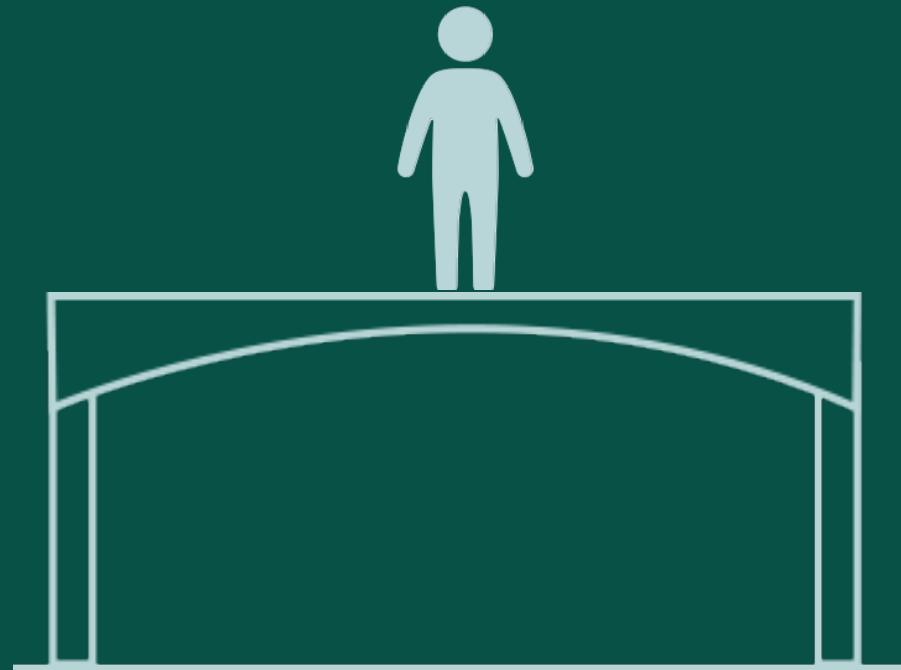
Catalan vault floor slab at SUDU project, Ethiopia, with lightweight stiffening walls and compacted fill. Image retrieved from López López, D., Van Mele, T., & Block, P. (2016). Tile vaulting in the 21st century. *Informes de La Construcción*, 68(544), 162. <https://doi.org/10.3989/ic.15.169.m15>
